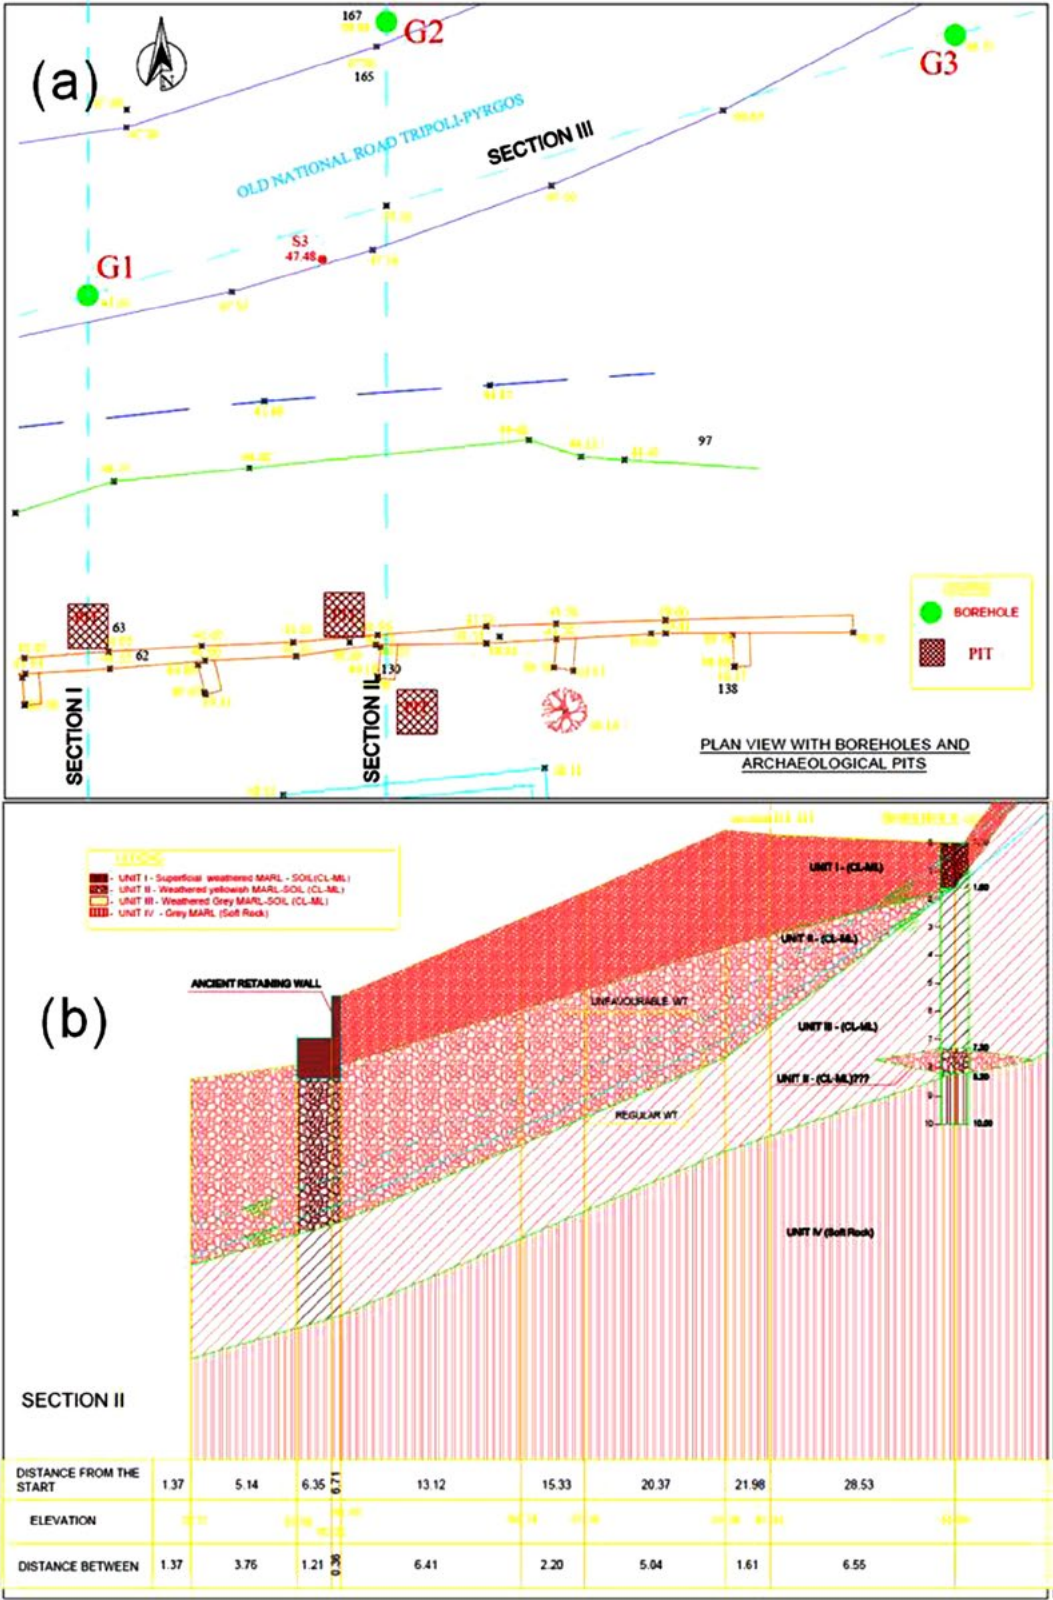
(a) General plan view with indicative borehole sites and (b) Geotechnical section in approximate centre of the retaining wall (Section II) (Egglezos *et al.* 2013).
